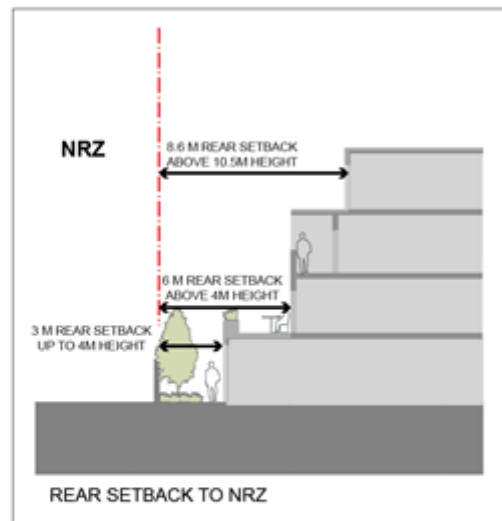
Rear building setbacks for sites adjacent to the Neighbourhood Residential Zone
